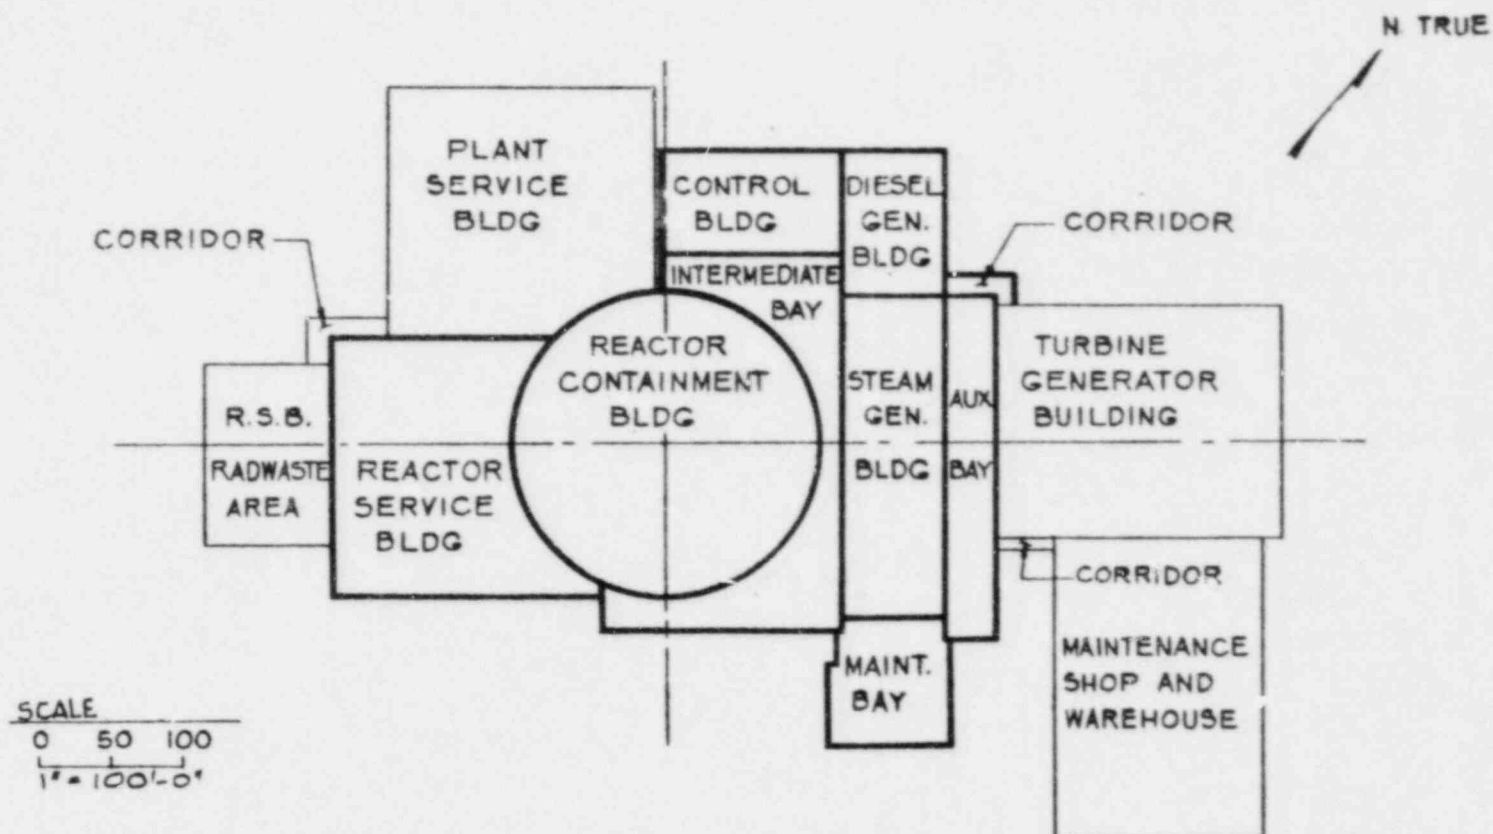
LAYOUT OF PLANT STRUCTURES IN RELATION TO THE SECURITY BARRIER
